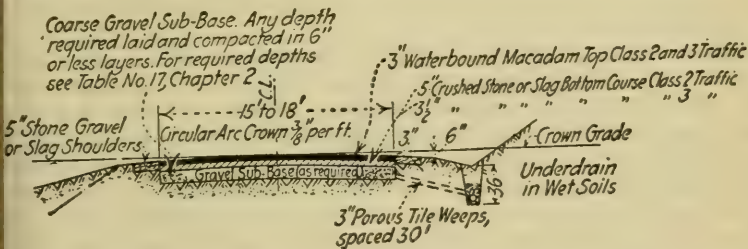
A.—Recommended waterbound macadam pavement section gravel foundation Class II or III traffic.
